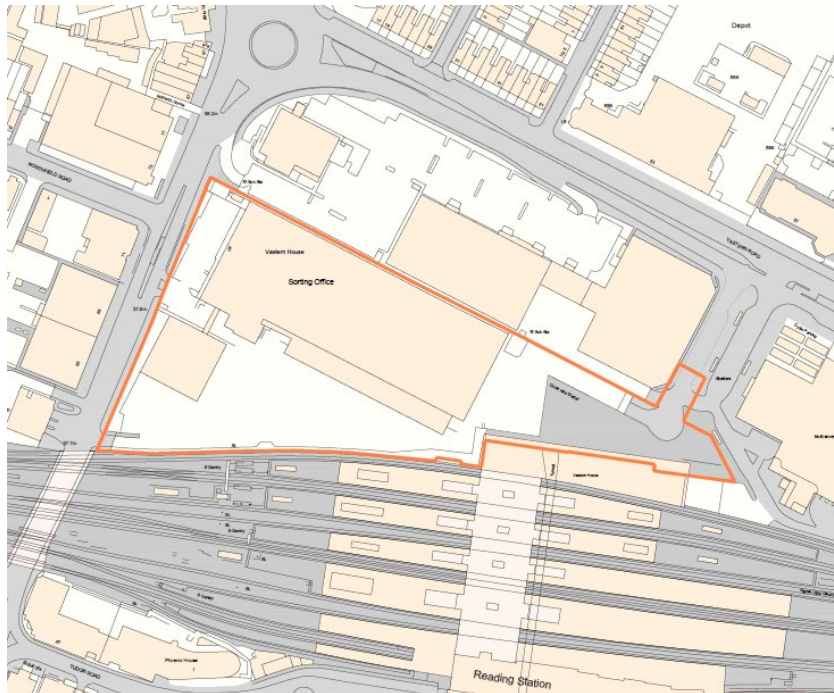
Extract of A11113 C 2002 Rev P2 - Existing Site Location Plan with Application Boundary, as received 08/02/2019
